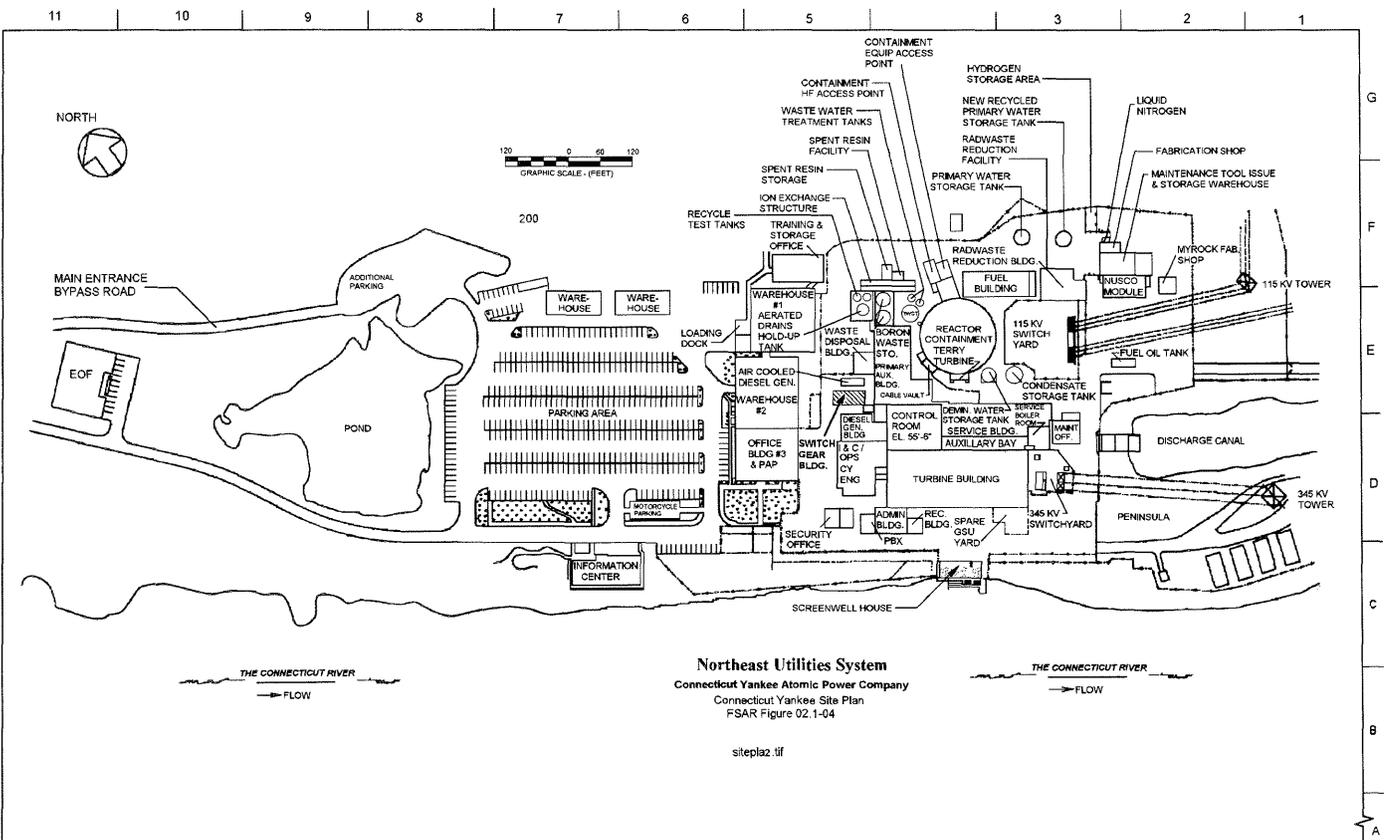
SITE PLAN SHOWING LOCATION OF SCREENWELL HOUSE
